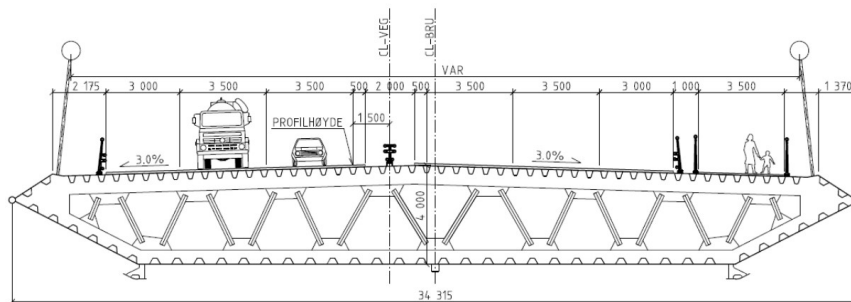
Sketch of a proposed cross-section of Langenuen Suspension Bridge where the box girder is made of steel [82].
